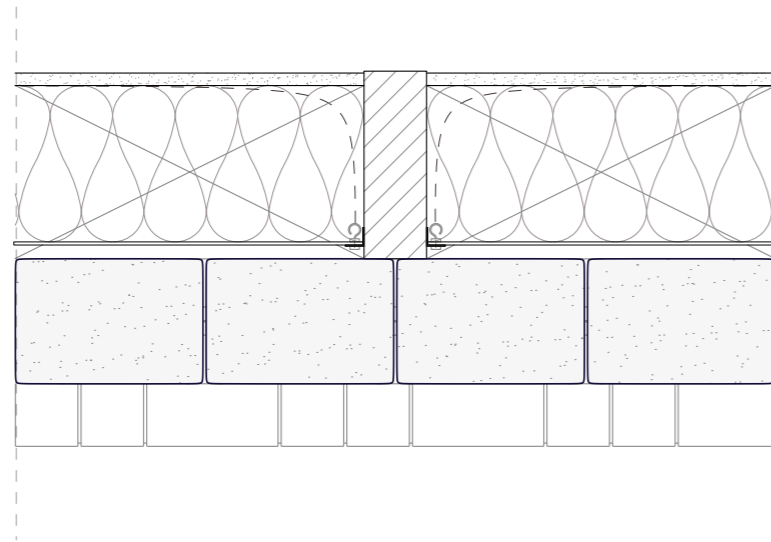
| Detail B. New wall, rammed demolition waste wall, with brick top layer, timber framework, rammed demolition waste blocks, metal mesh, reed insulation, loam finish
